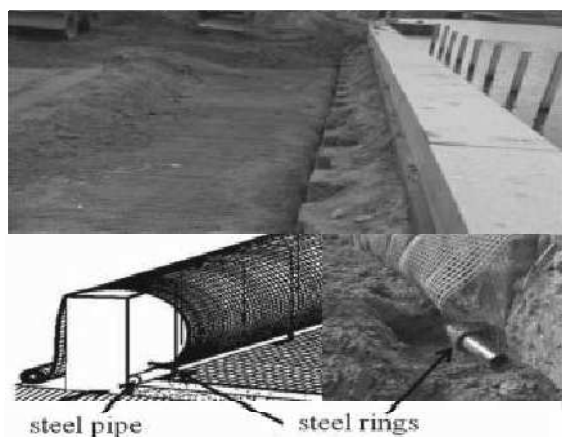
Connection detail between sheet pile wall and geogrid anchor
